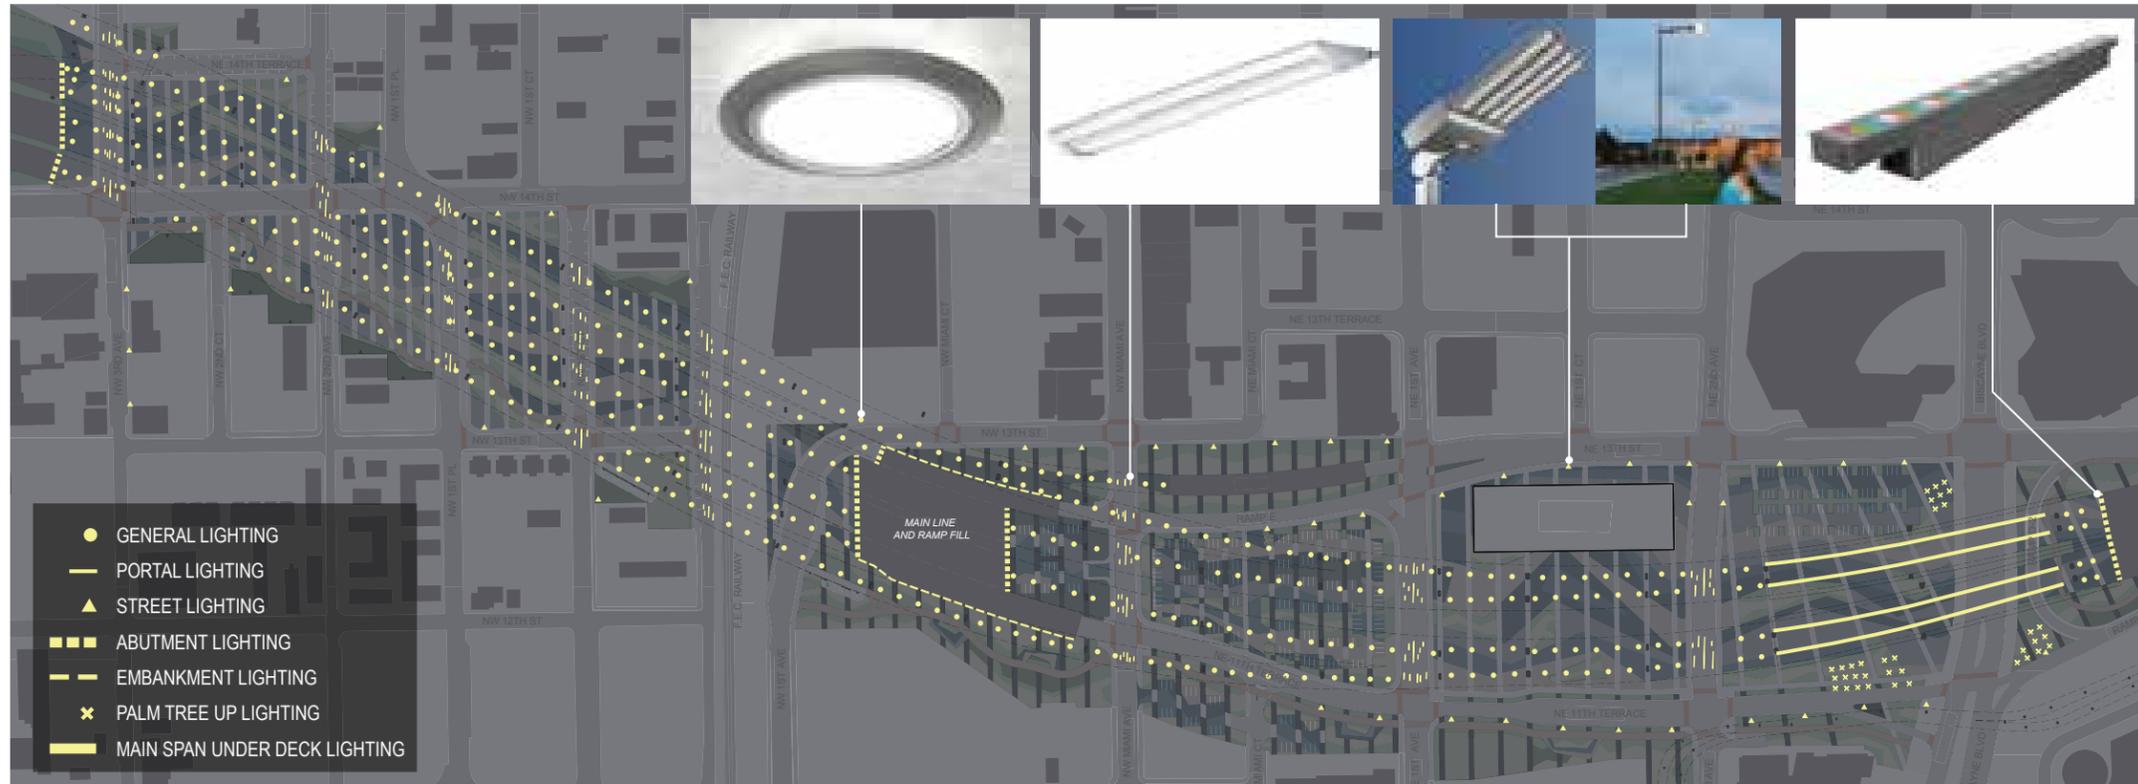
Overall Project Lighting Plan; Bridges, Roadways, Plazas, Gardens, and Greenway
